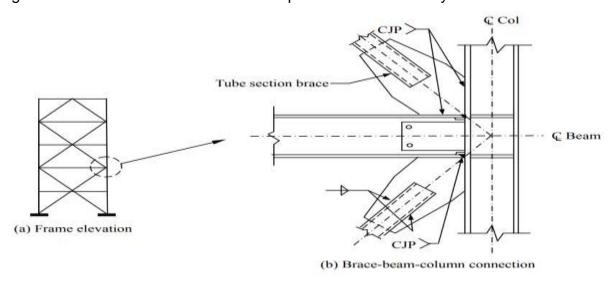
Gusset Plate Connection Example for a Special Concentrically Braced Frame
